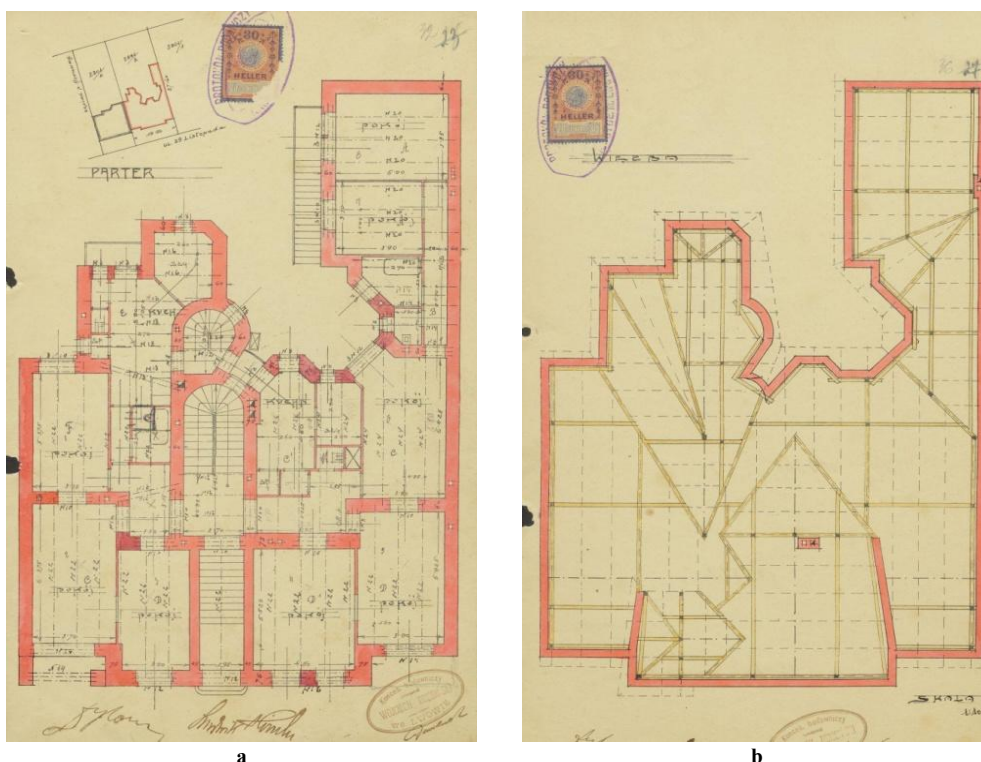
Archival project of 44 Konovaltsia Street, designed by Jan Bagienski in 1911: ground floor plan (a); plan of the attic (b) [23]
